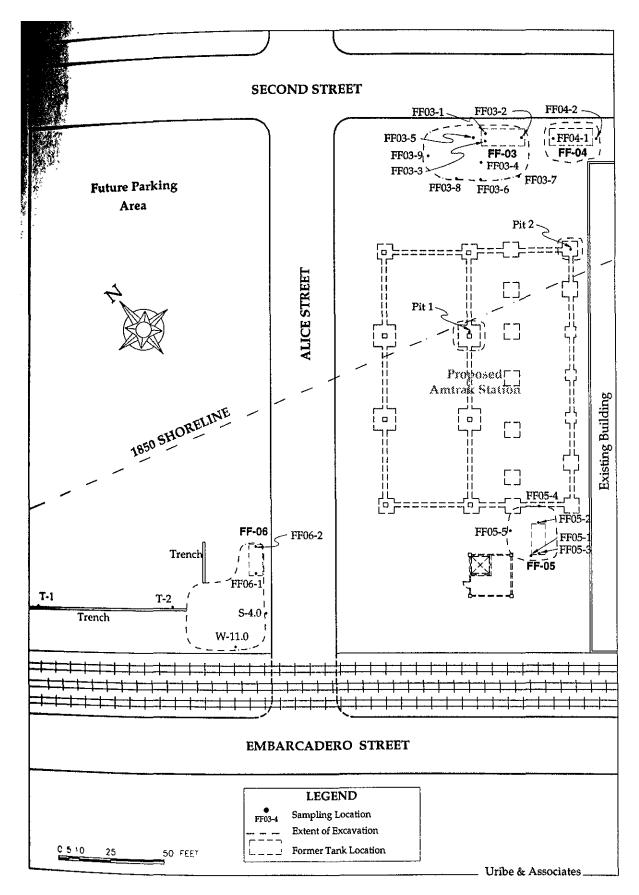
Site Plan, with Sample Locations and Extent of Excavation
